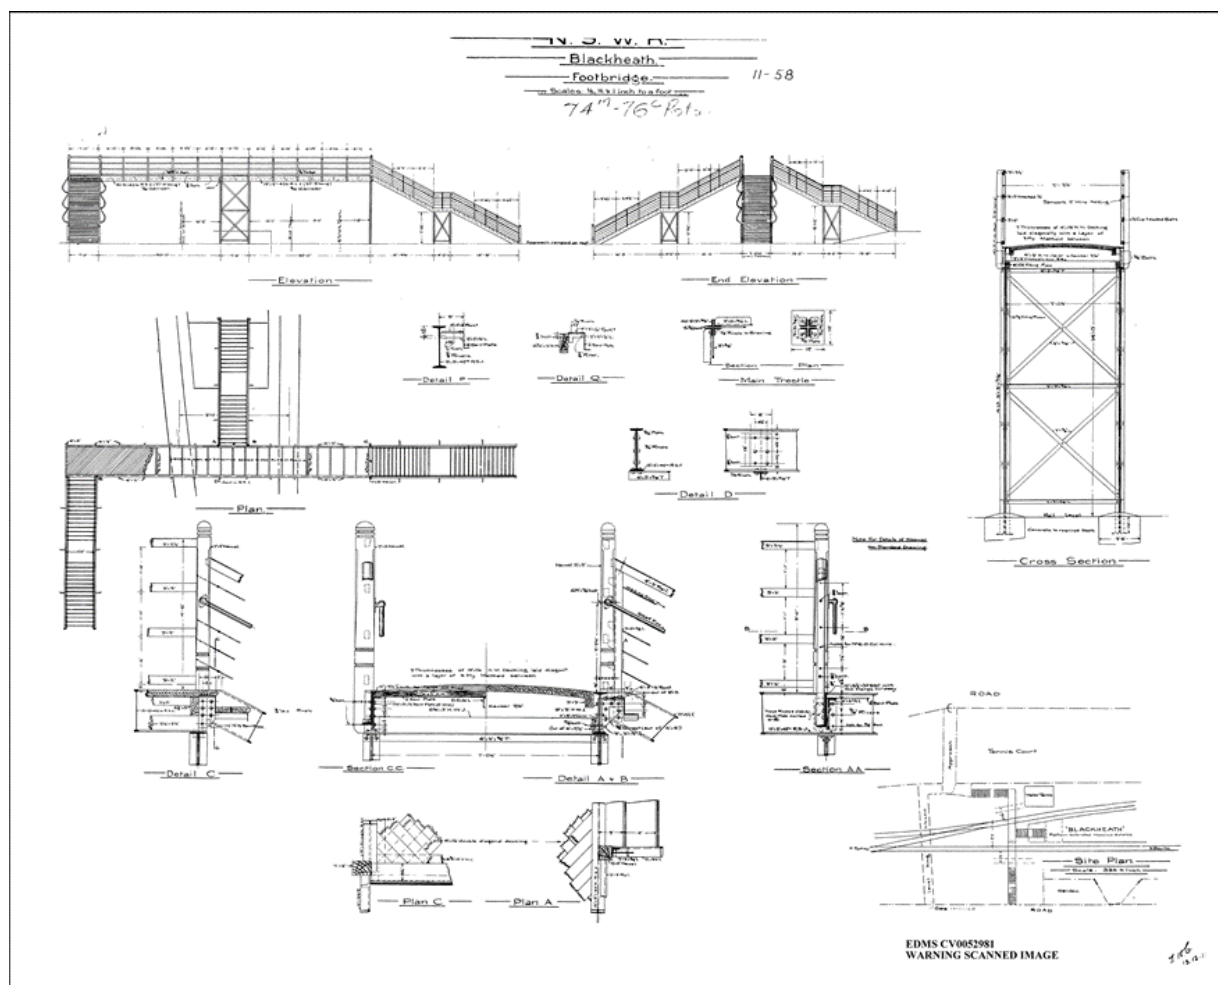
Historical plan of the footbridge, 1911 Source: Sydney Trains Plan Room, CV0052981
